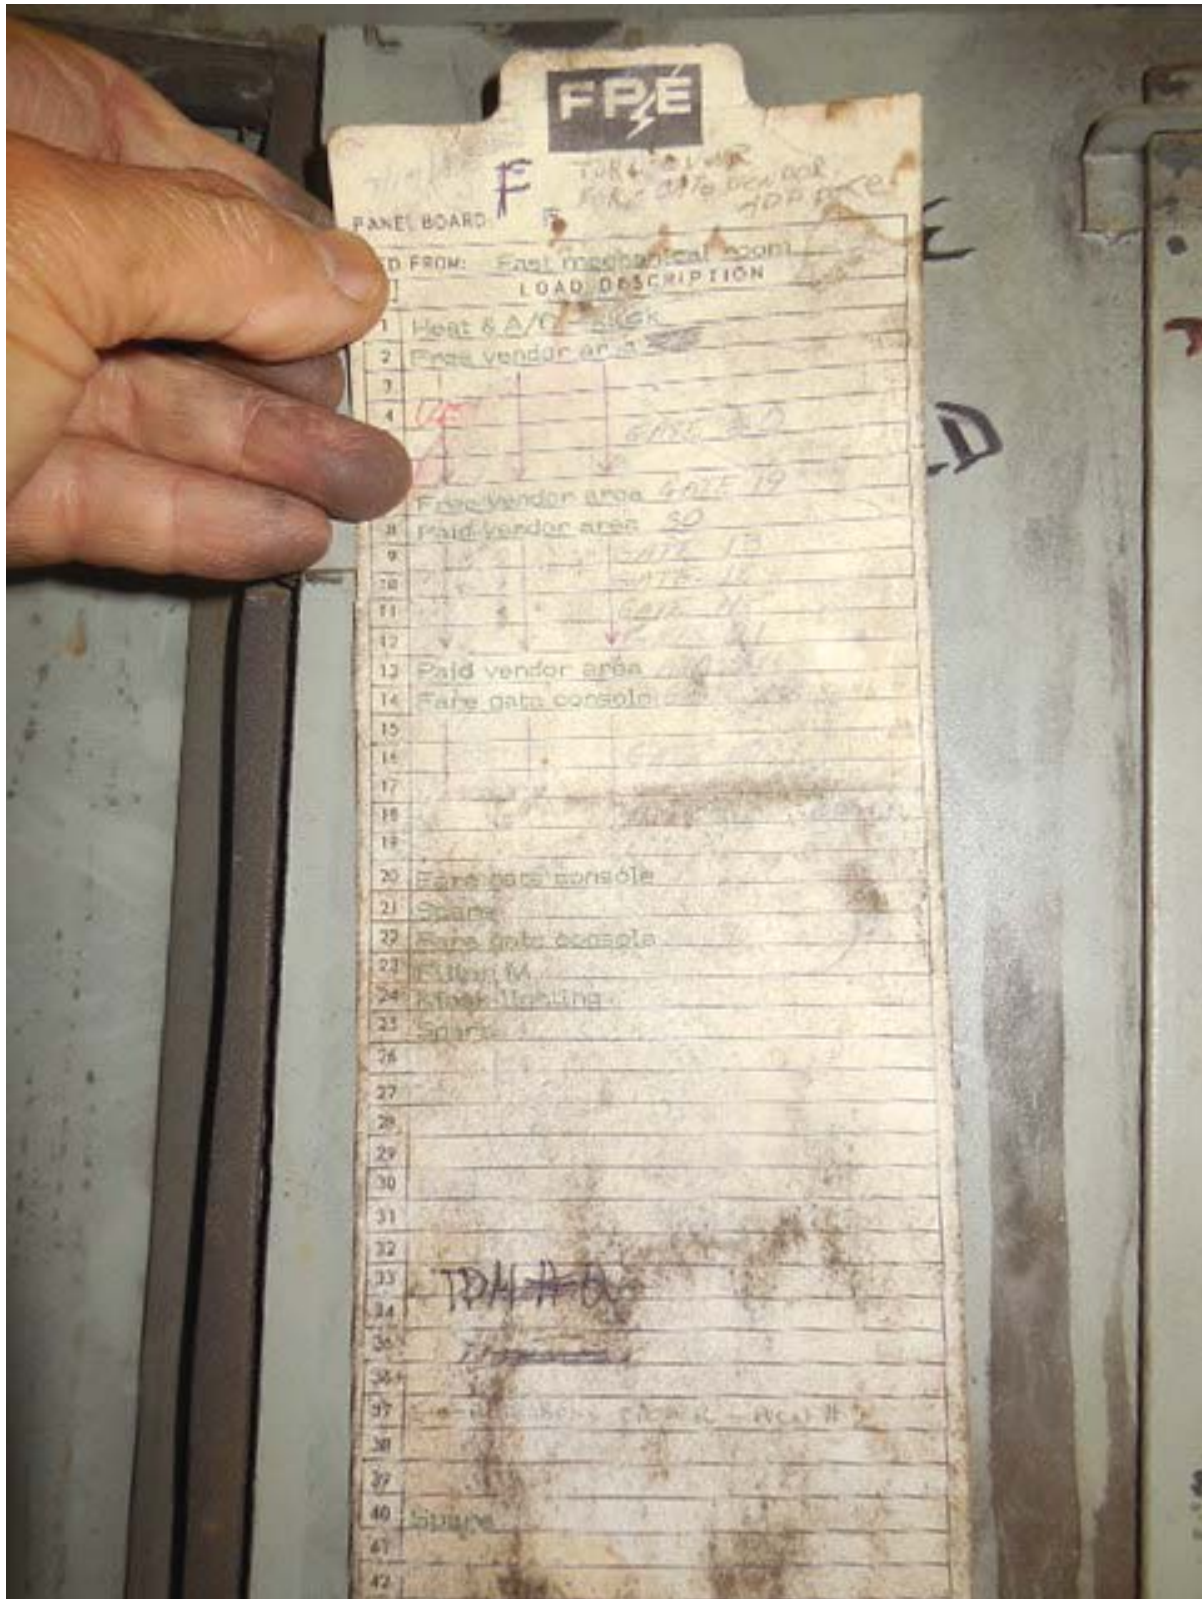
G01 Benning Road – AFC Panel F in Room 102
